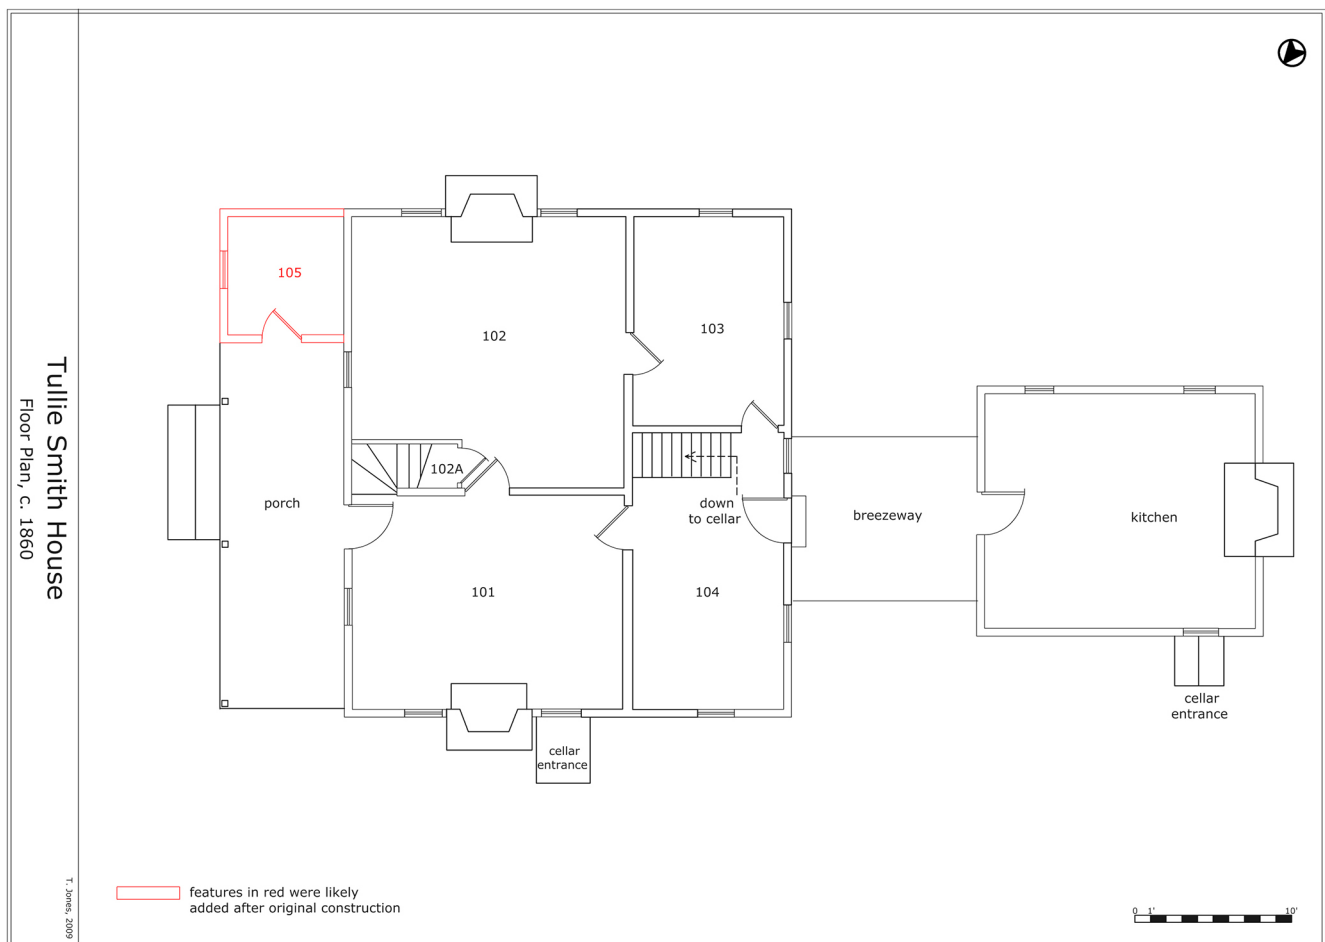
Floor plan as house probably existed in 1860. (Drawing by T. Jones, 2009)
